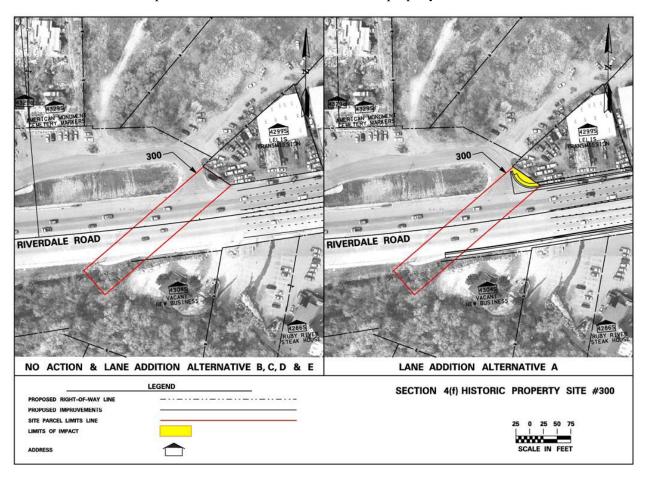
Site Plan 300 - No-Action and Lane Addition Alternatives A, B, C, D, and E.
